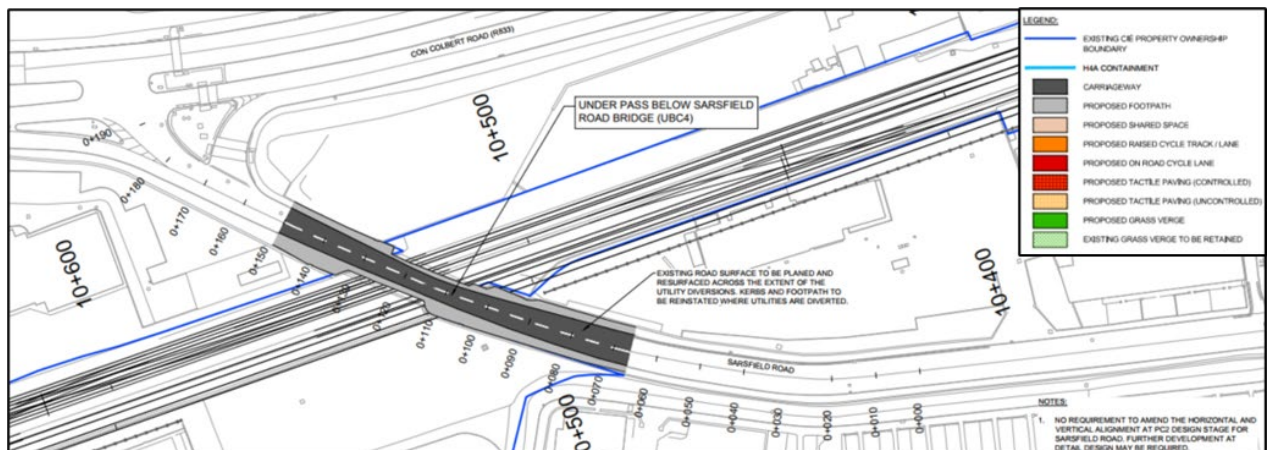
Sarsfield Road – Area of Road and Footpath
